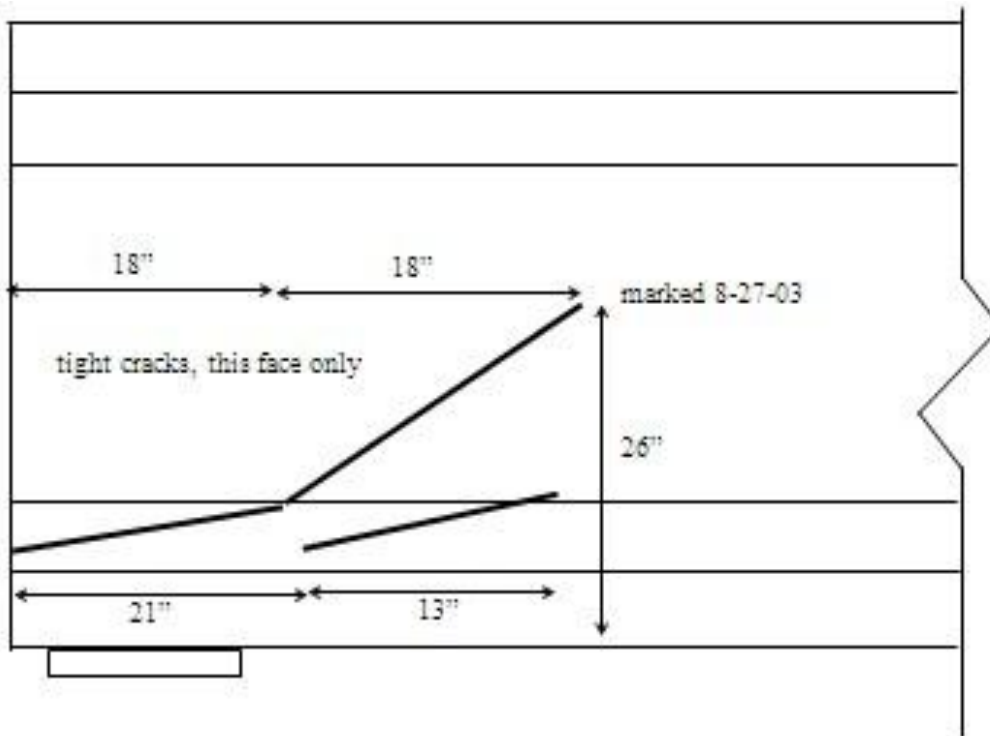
Crack diagram, exterior girder, west side, west face, north abutment (#9728).
